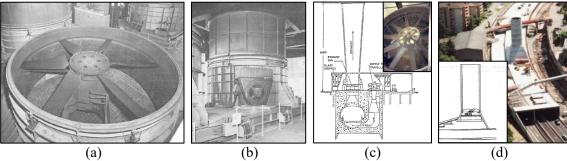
Low-pressure fans examples: (a, b) Mersey Kingsway Tunnel, (c) Dartford West Tunnel, (d) Spier Tunnel
